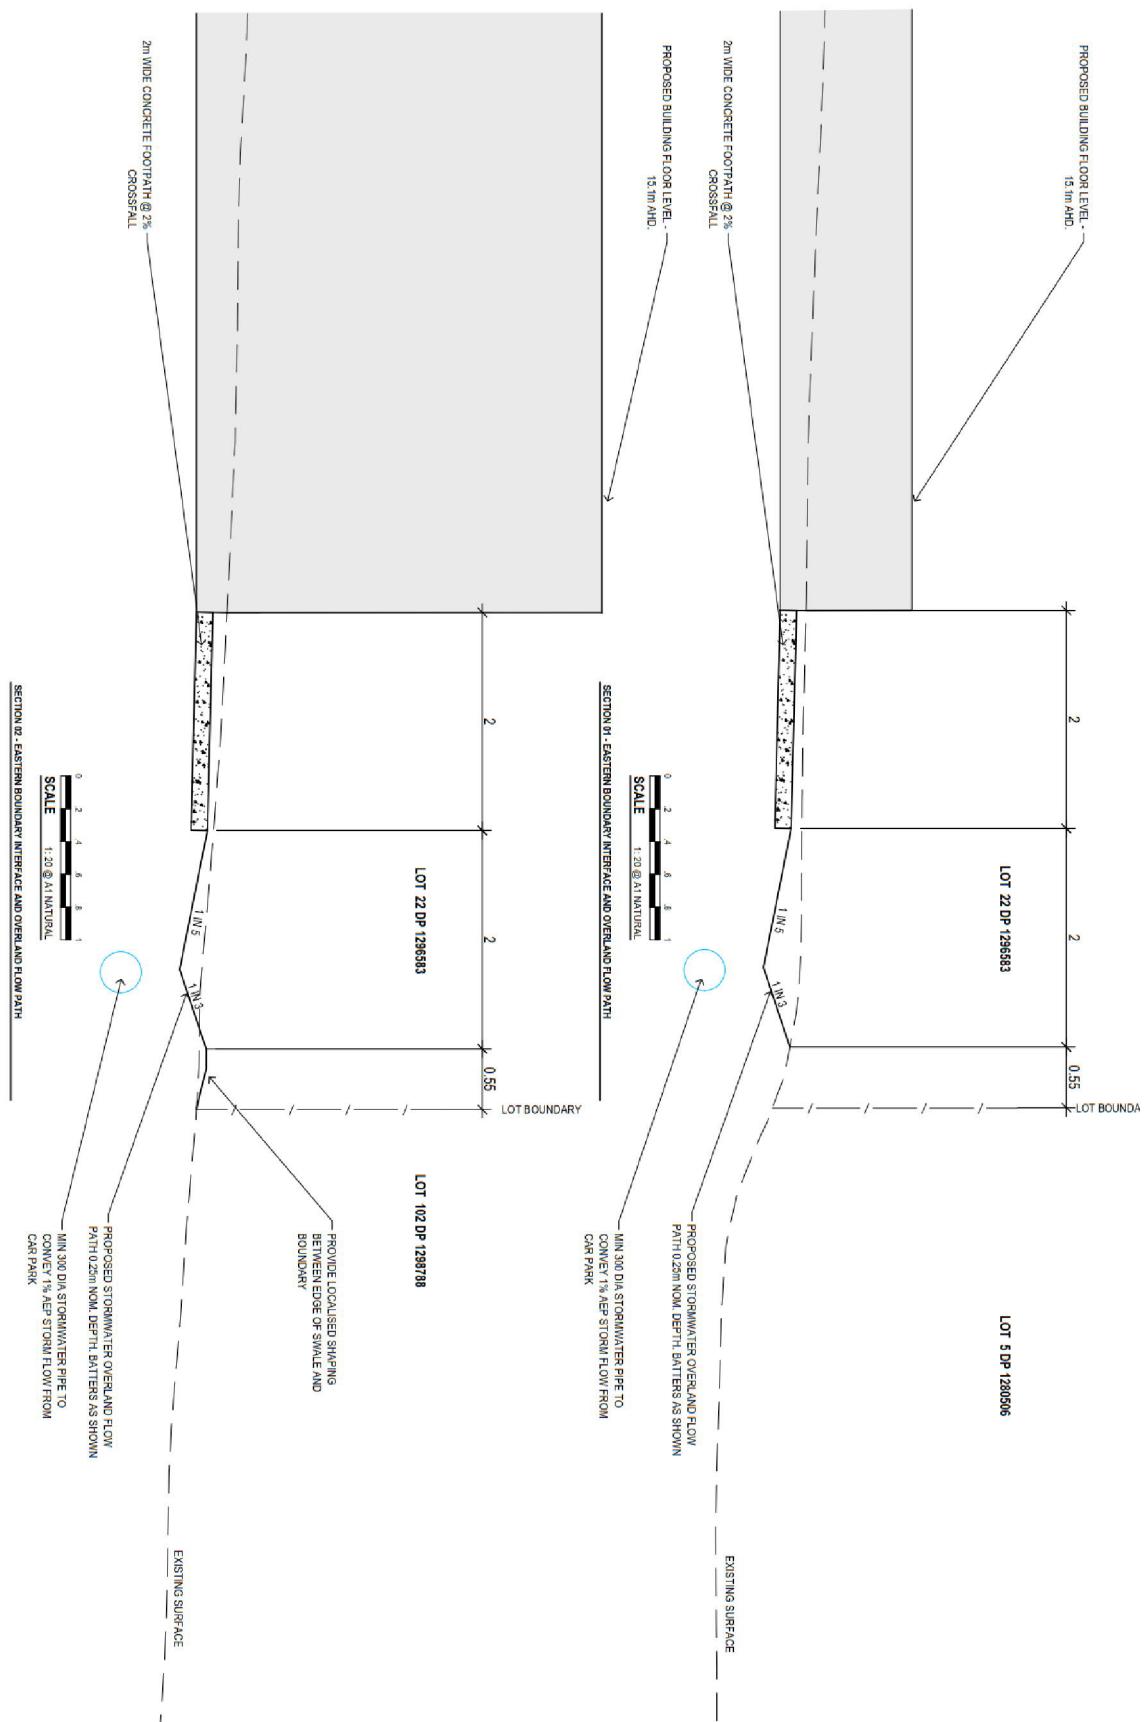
Typical Sections showing proposed treatment between proposed buildings and existing lots to the east of the site
